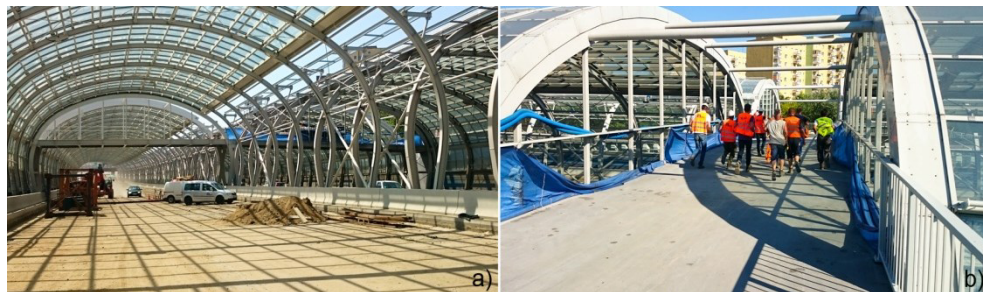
Footbridge in Warsaw over S8 express road during load test.
